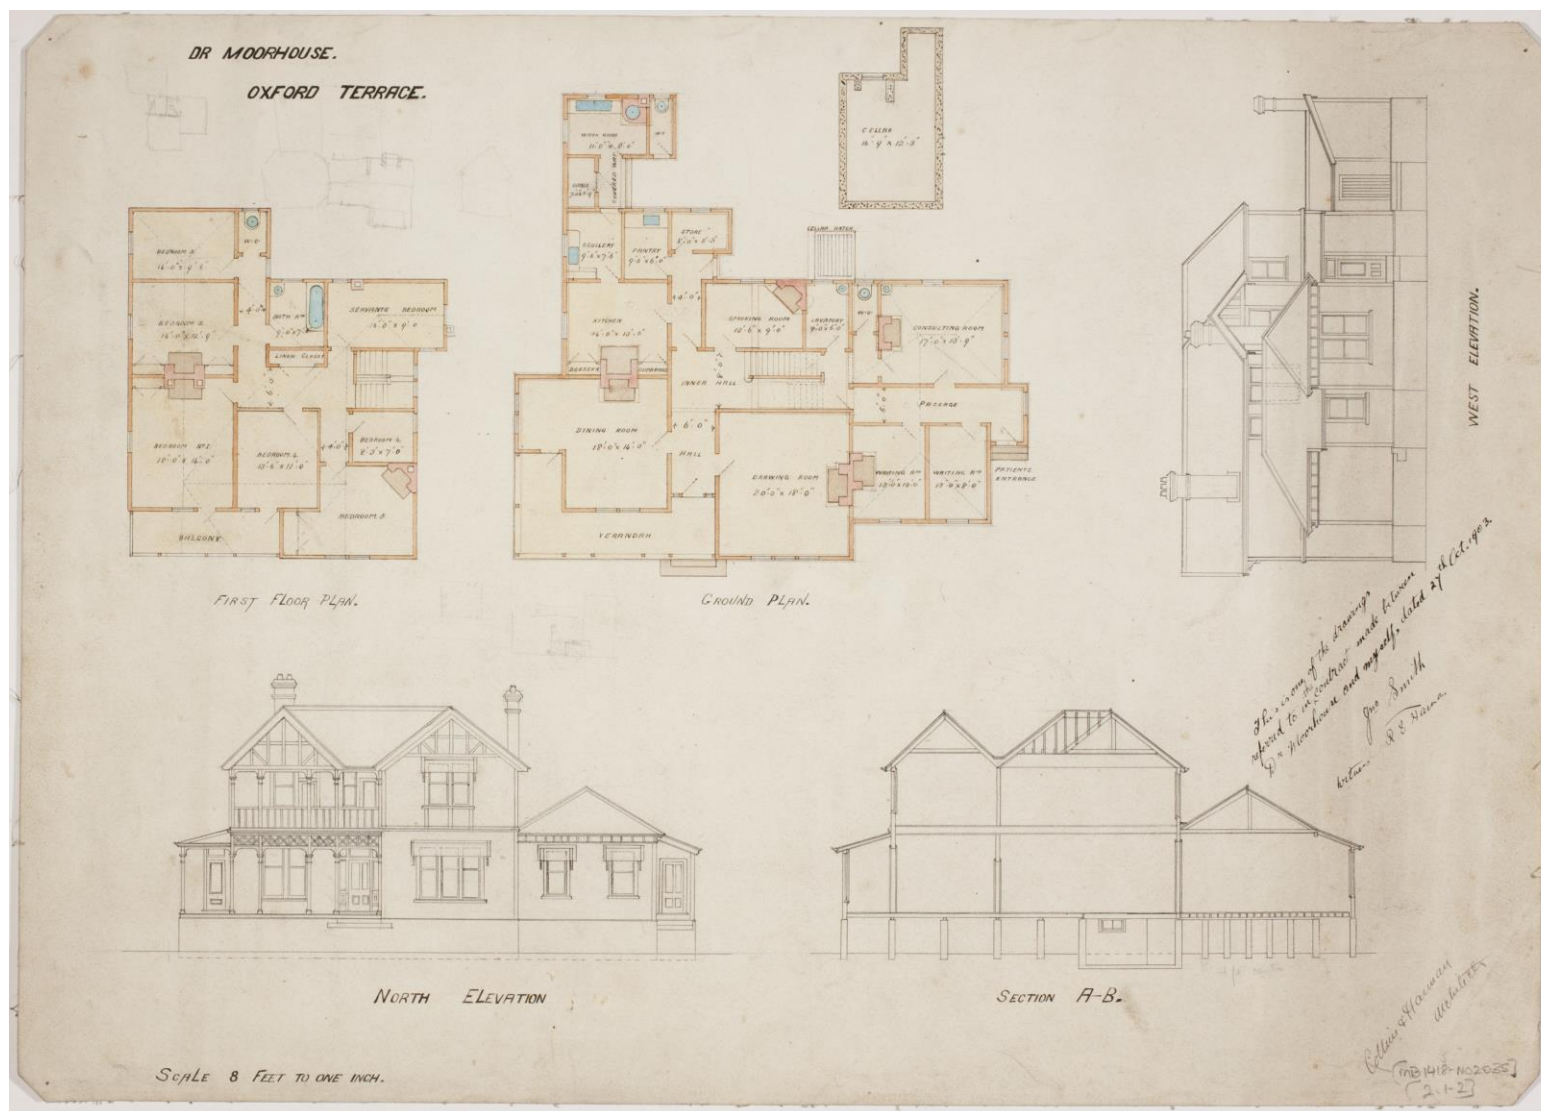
Collins and Harman, Dr Moorhouse, Oxford Terrace, plans, elevations and section (1903).
